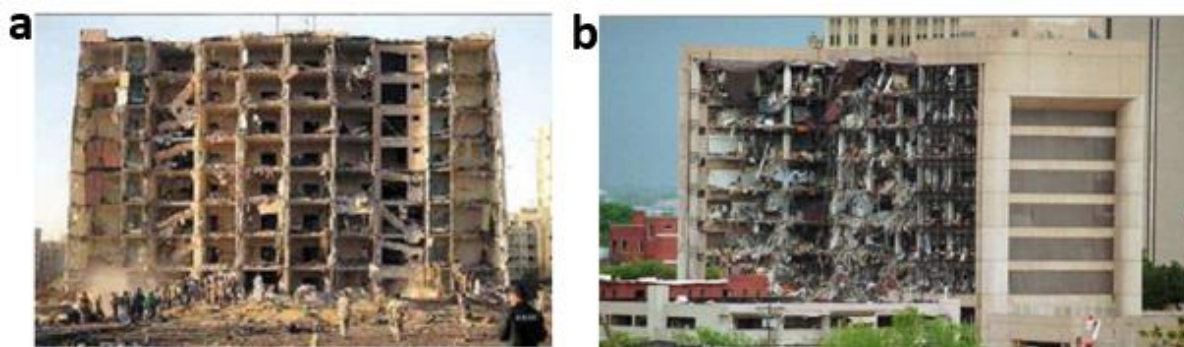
(a) Building collapse in Khobar Towers due to blast action (1996) (b) Building of Federal Murrah Building after blast attack (1995) (Crawford et al., 2015)
